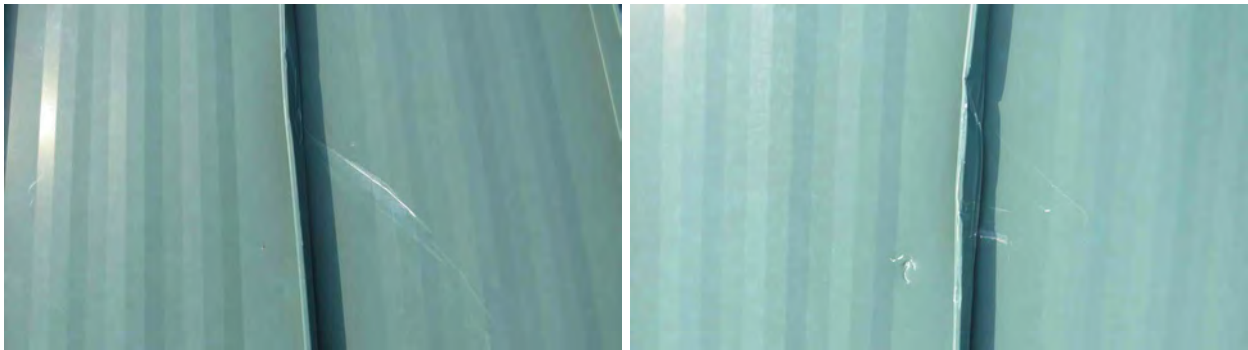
Roofing on the shrewmaker center for workforce tech (12) with wind-related conditions.
